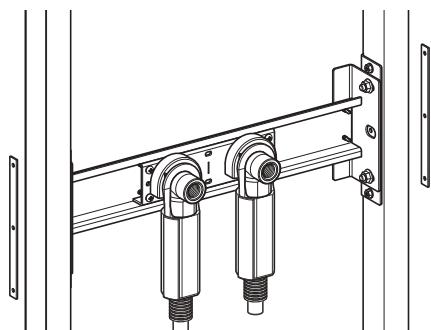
Installation in a lightweight wall with a Geberit Duofix crossbar for a wall-mounted tap, variable tap position
